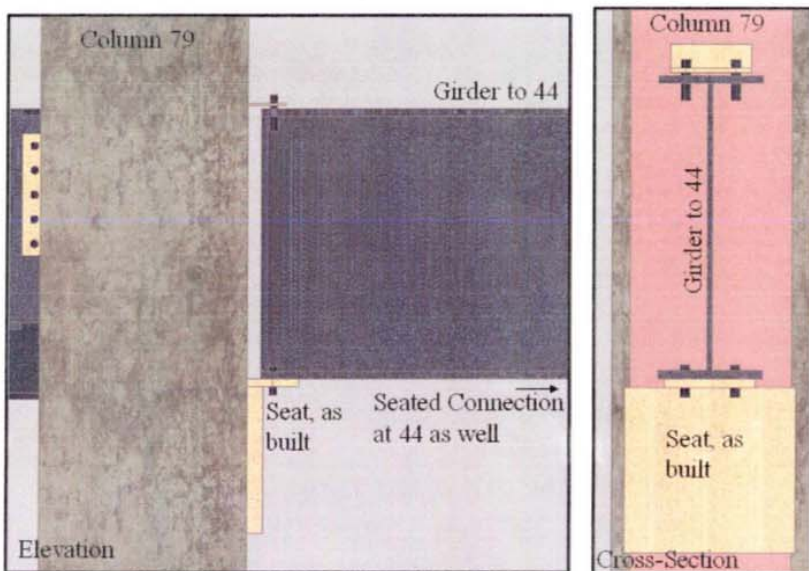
Elevation and Cross Sectional Views of Seated Connection (C1) at Column 79
